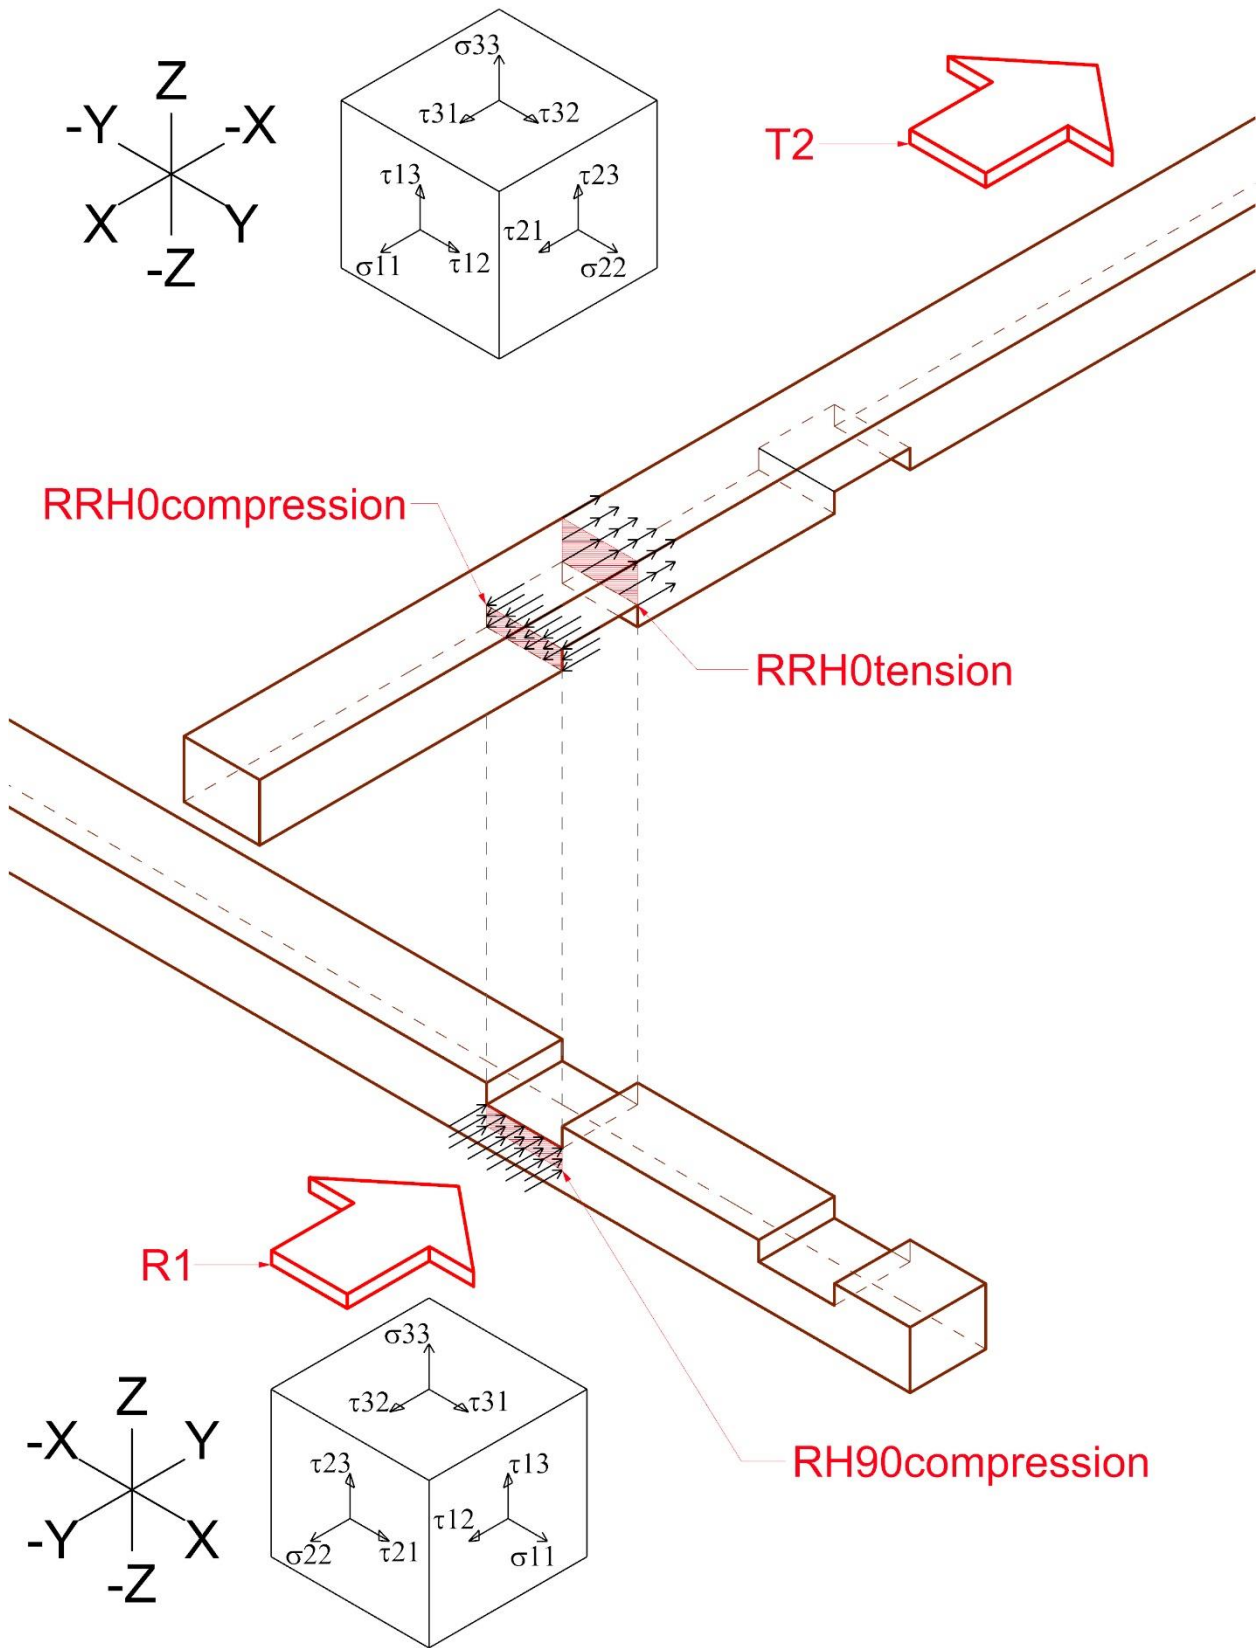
Roof Rafter Head Axial stresses : Crossing rafters T2-R1
